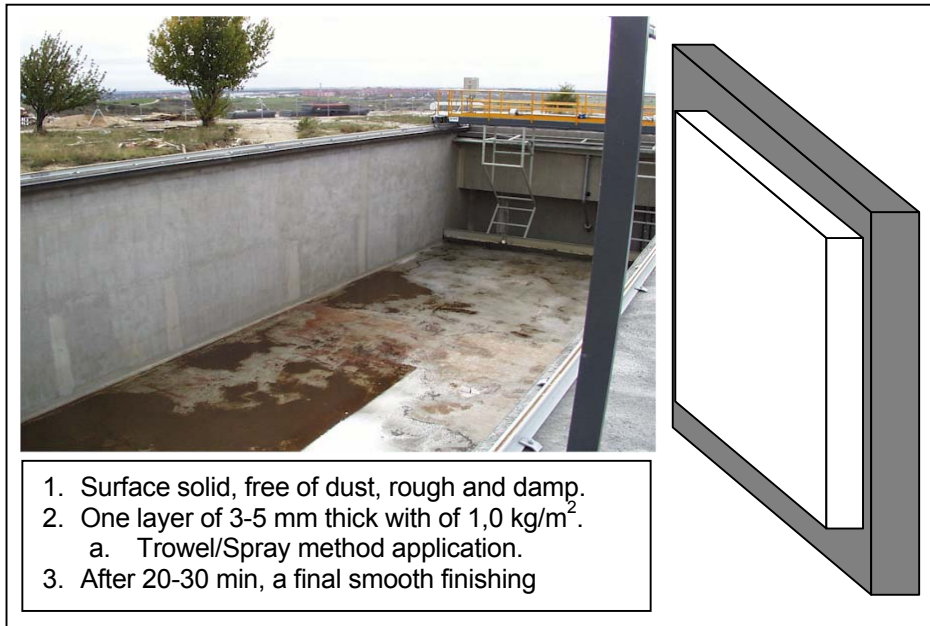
Protection of concrete subjected to abrasion by water flow and mechanical elements with CONCRESEAL® PLASTERING in processing units of wastewater treatment plants
